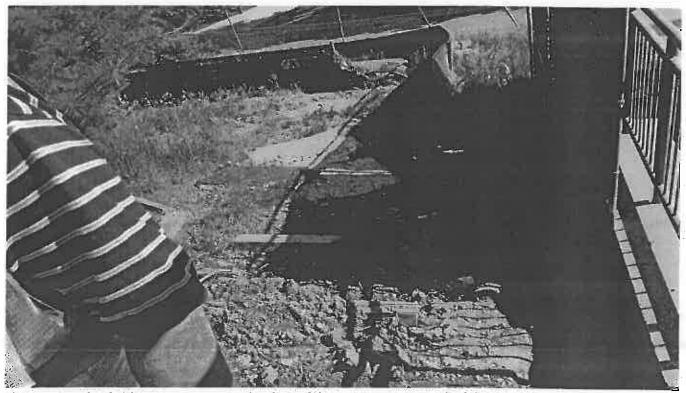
Unmaintained E and S controls at the Slope of the Tunnel Project North of the Site
